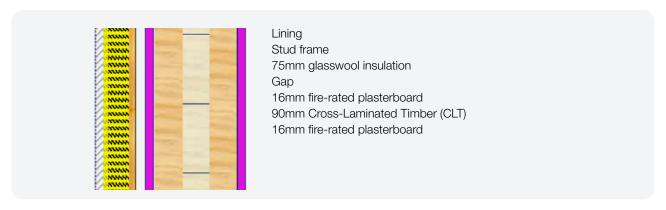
Typical direct-fix fire-protective covering applied to CLT wall with additional acoustic treatment.
